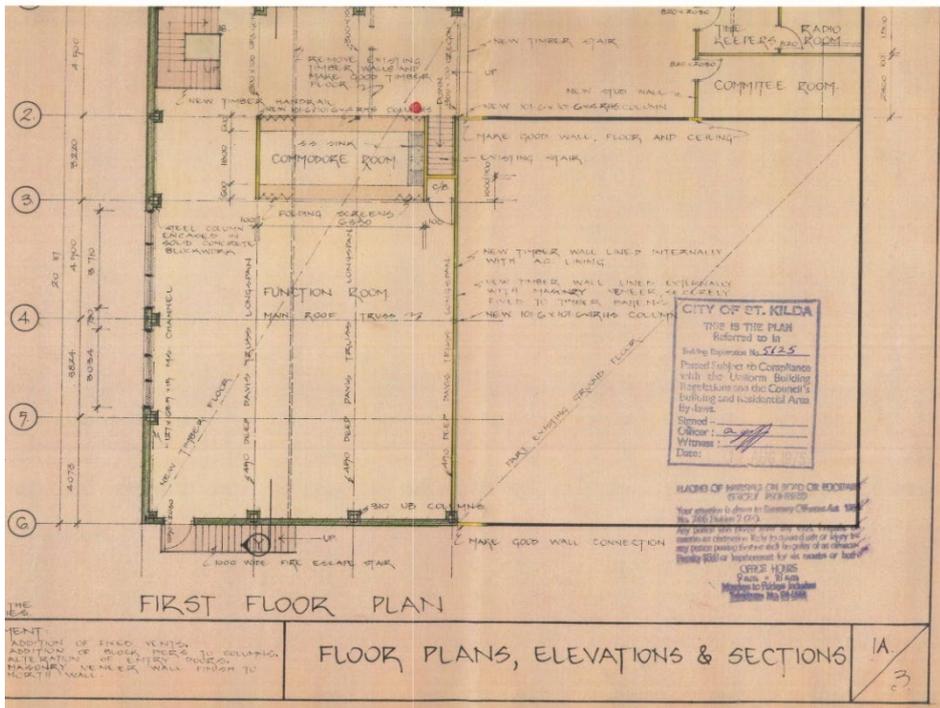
Detail of the First Floor Plan, dated 1975. (Source: City of St Kilda)
